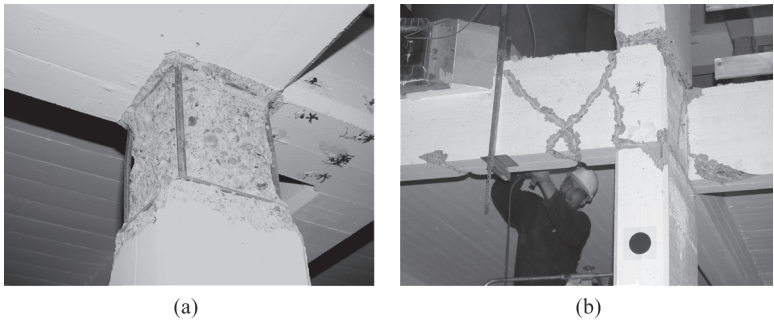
Columns C3 (a) and C6 (b) at 1st story after removal of unsound concrete
